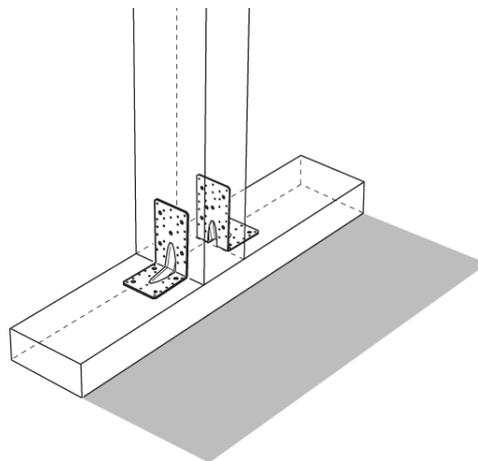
BEAM TO BEAM CONNECTION
